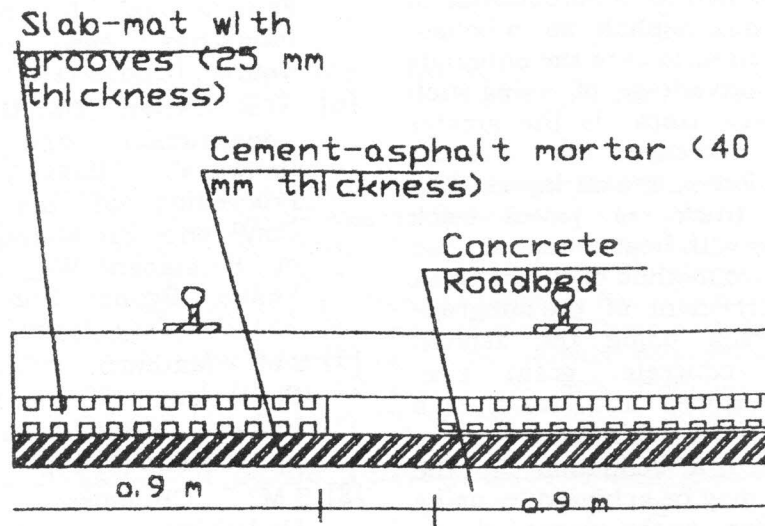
Construction elements of the slab track on elastic grooved mat.
